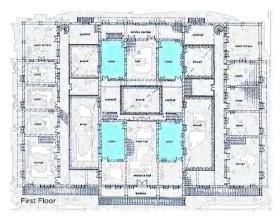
The Blue Mansion Floorplan (Source: VFM Leonardo, 2022)
